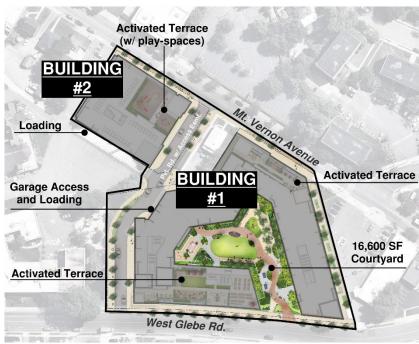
Rendered site plan of AHDC Glebe/Mt. Vernon
